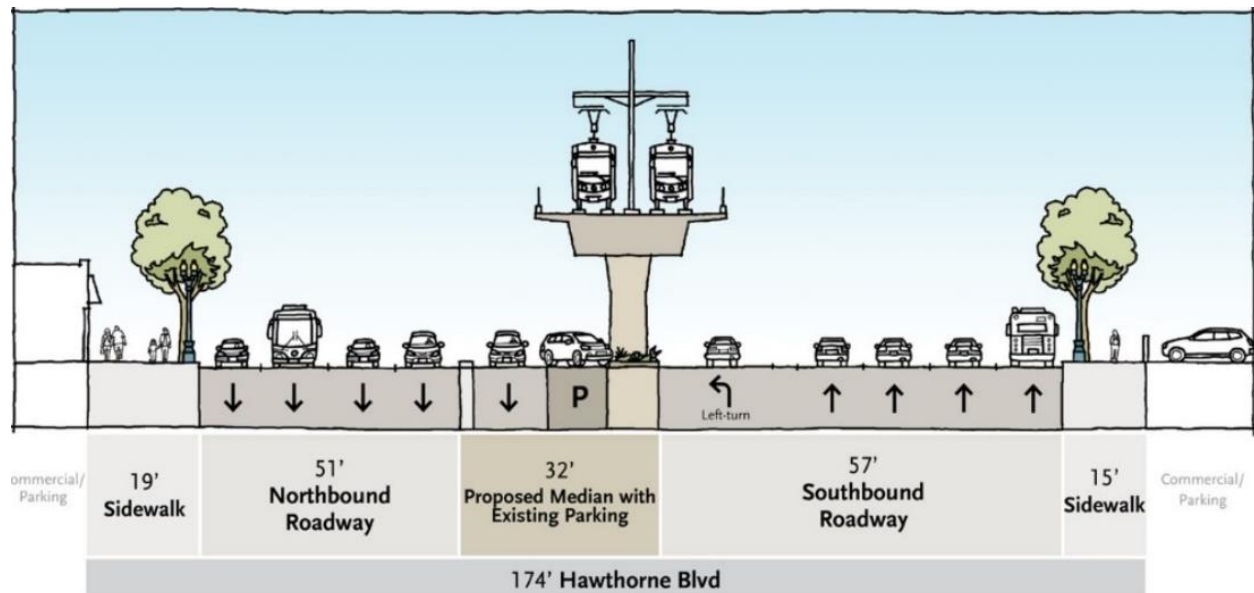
Hawthorne Option – Looking South Between 160th Street and Hawthorne Boulevard
